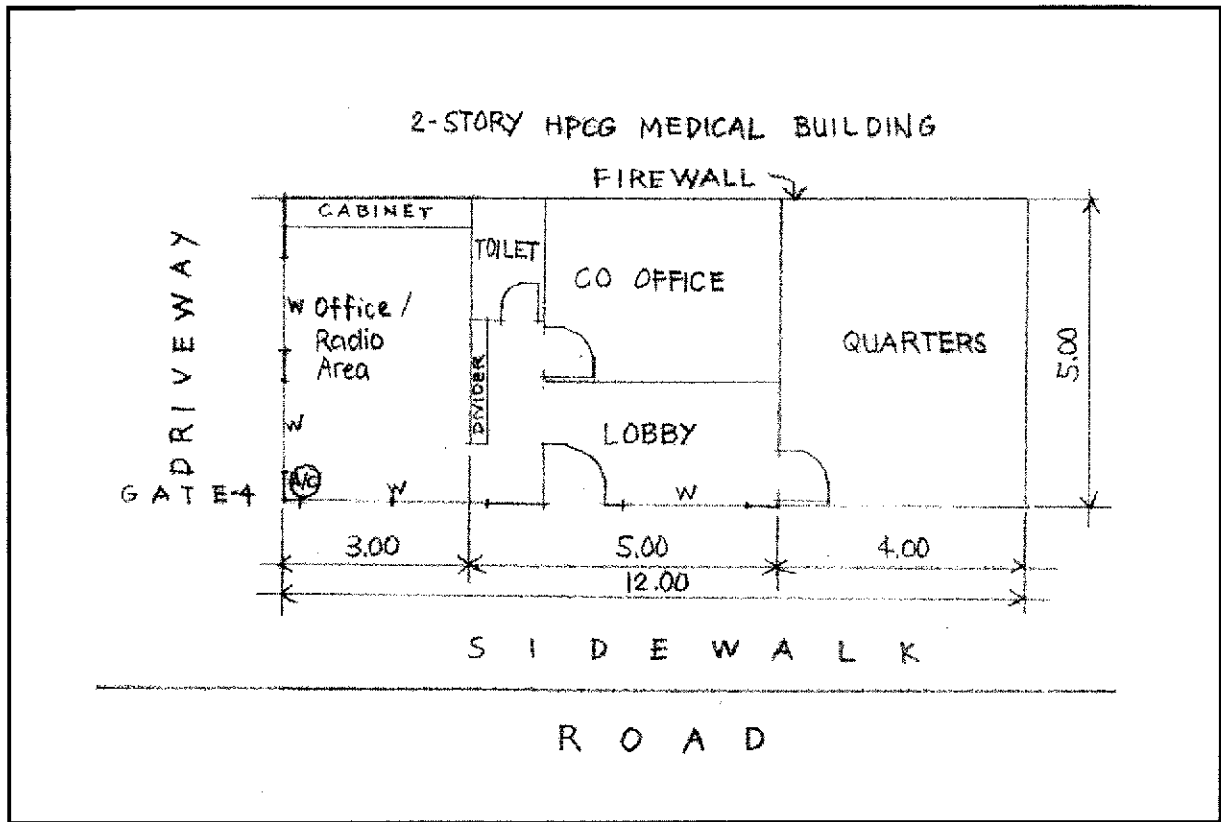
BUILDING LAYOUT FOR PSSC MANILA
